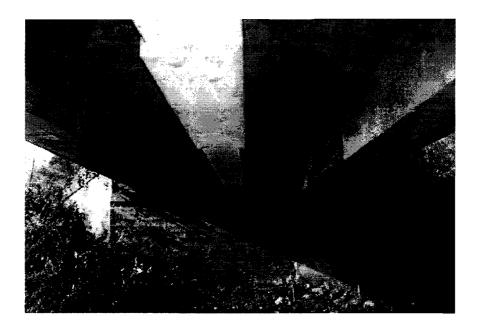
Deck-girder bridge: Structure # 6074, Bedford County (ca. 1920), showing details of girders on the underside of the bridge; one girder shows a later repair.
